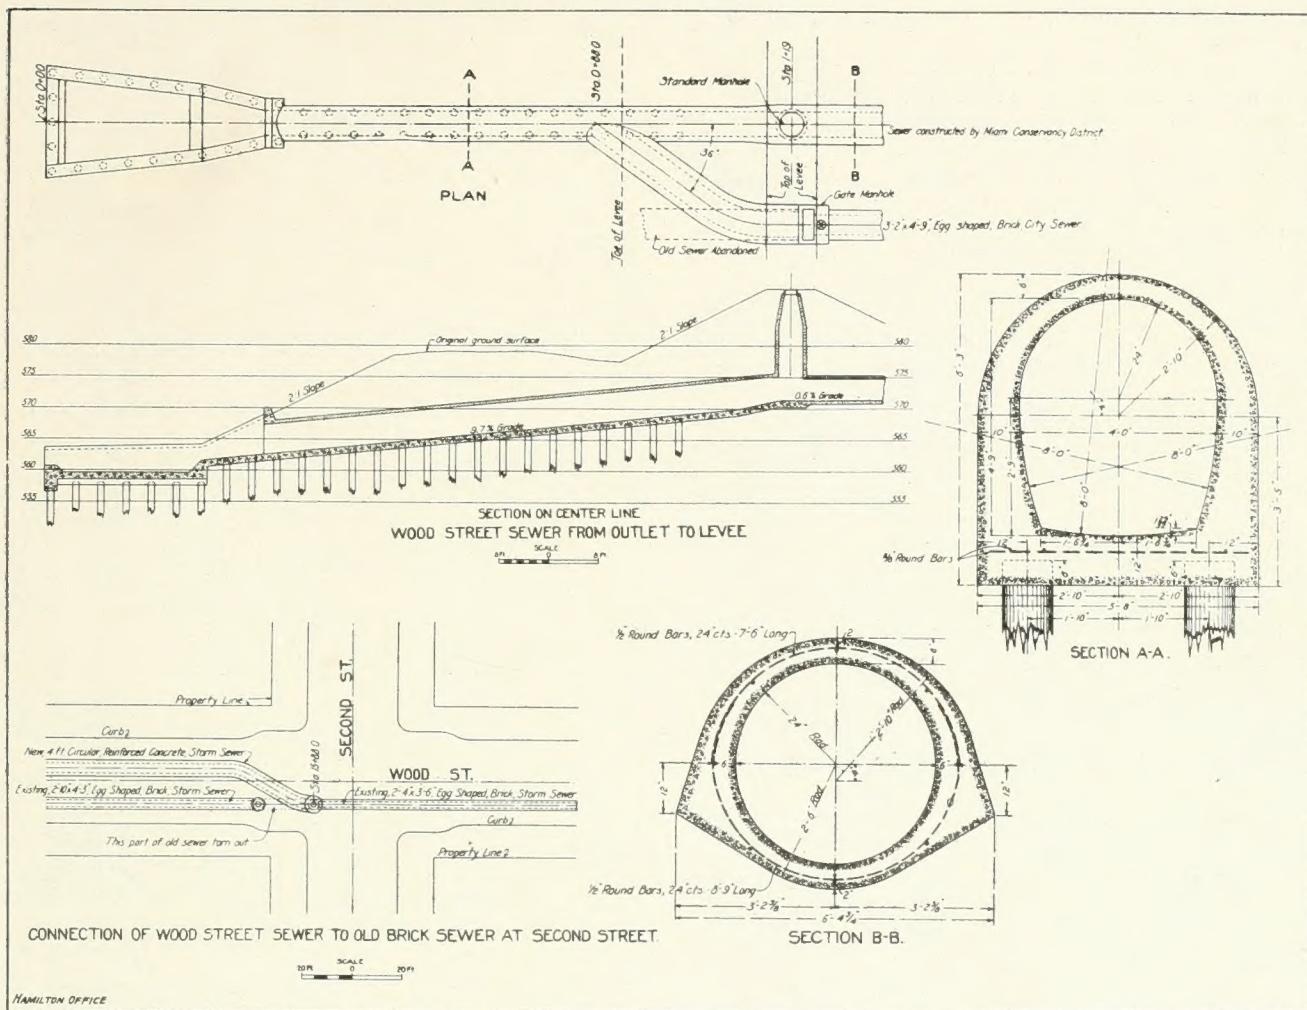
PLANS AND SECTIONS, WOOD STREET SEWER, HAMILTON
